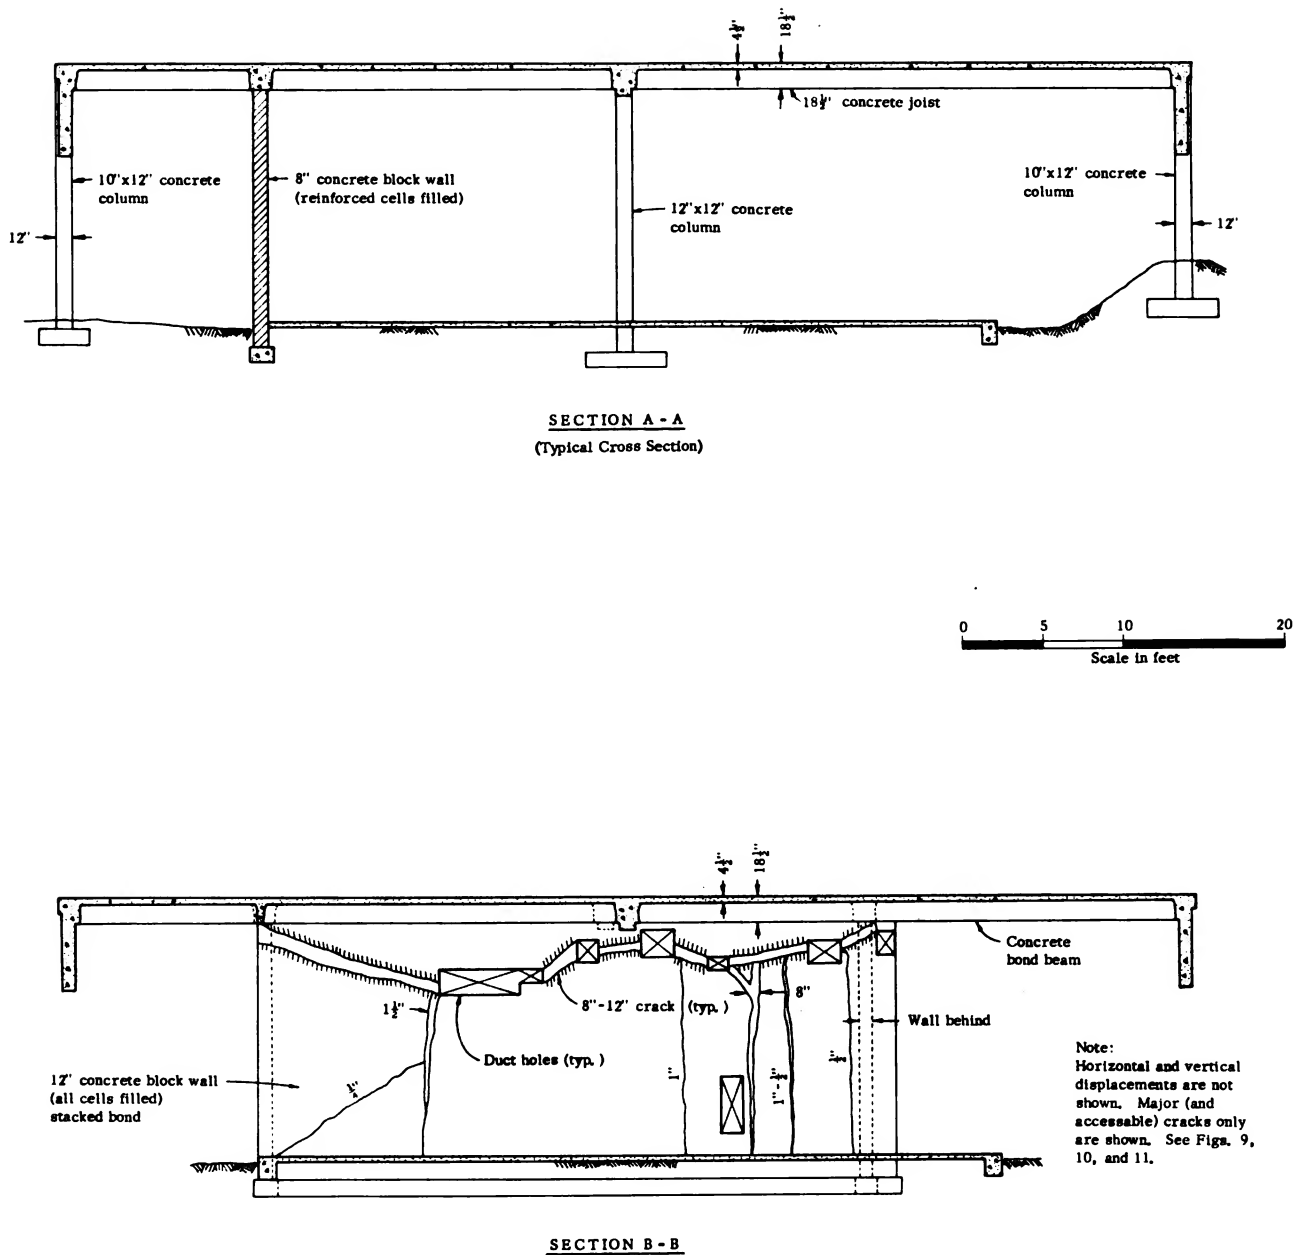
San Fernando Valley Juvenile Hall. Administration Building, west wing. Cross section and wall elevation.
